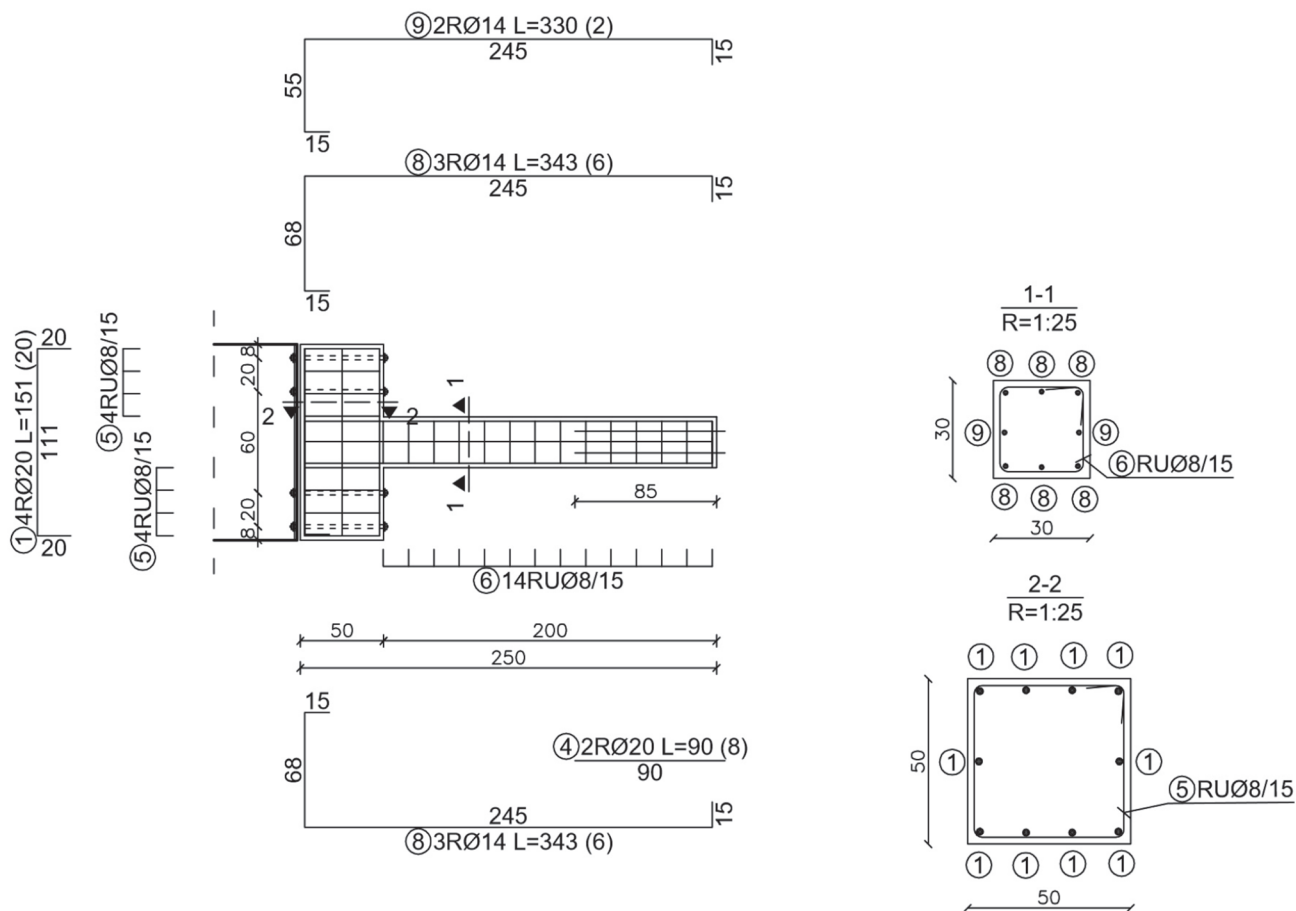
Detail of geometry and reinforcement of column models (Model M2)
